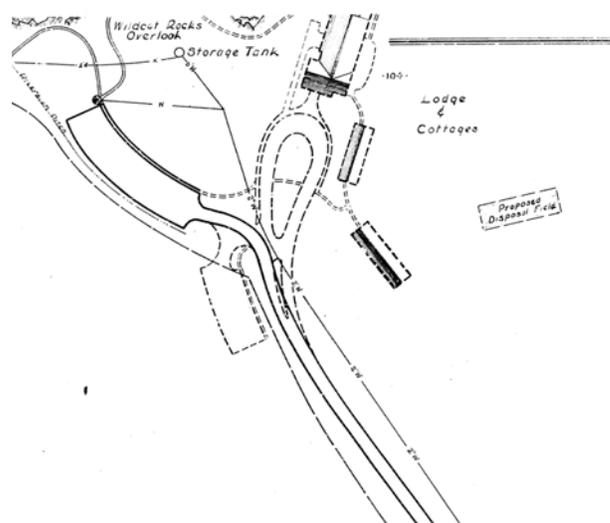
Portion of a 1943 Utility Layout Plan showing a proposed Lodge and Cottage configuration, 1943, DSC, TIC.
